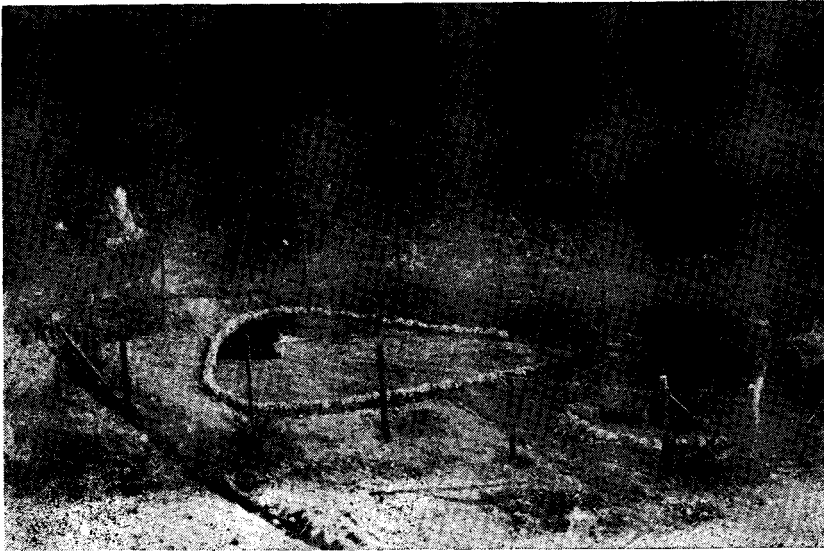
Completed fenced installation: rain collecting apron at left. The entrance to the drinking ramp and the shade slabs are the only parts of the unit exposed. The roof has been covered with earth.
